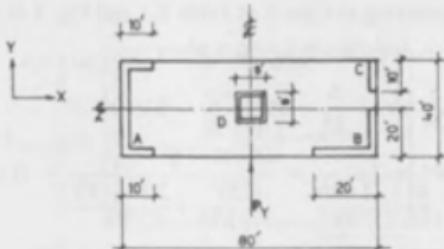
Plan of a shear wall structure of the illustrative Example 8.2.12.
